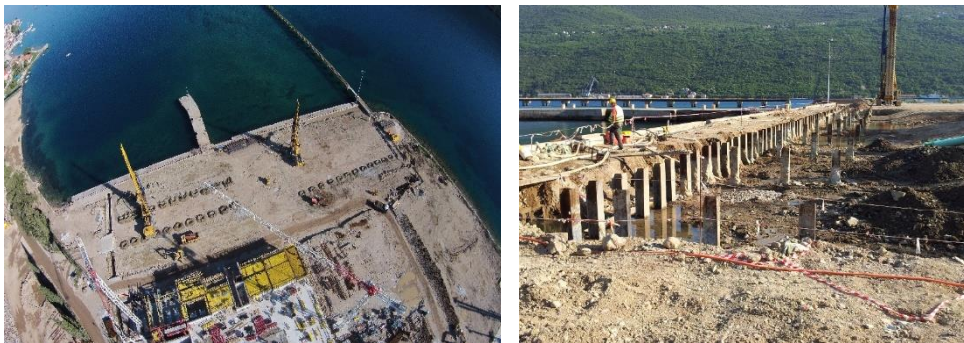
Ground improvement works along the shore line with deep soil mixing.
